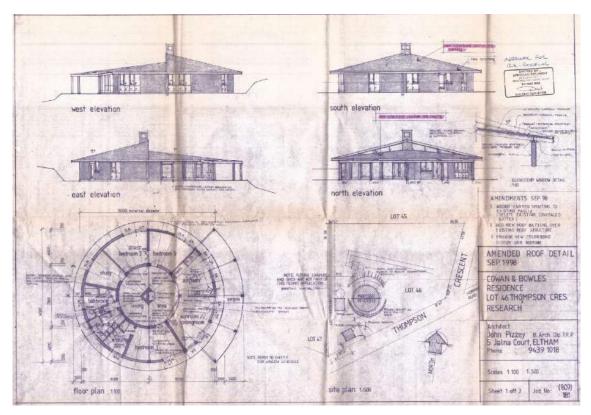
Plans by architect John Pizzey for Cowan and Bowles residence at 57 Thompson Crescent, Research, 1998. (Source: BP)
